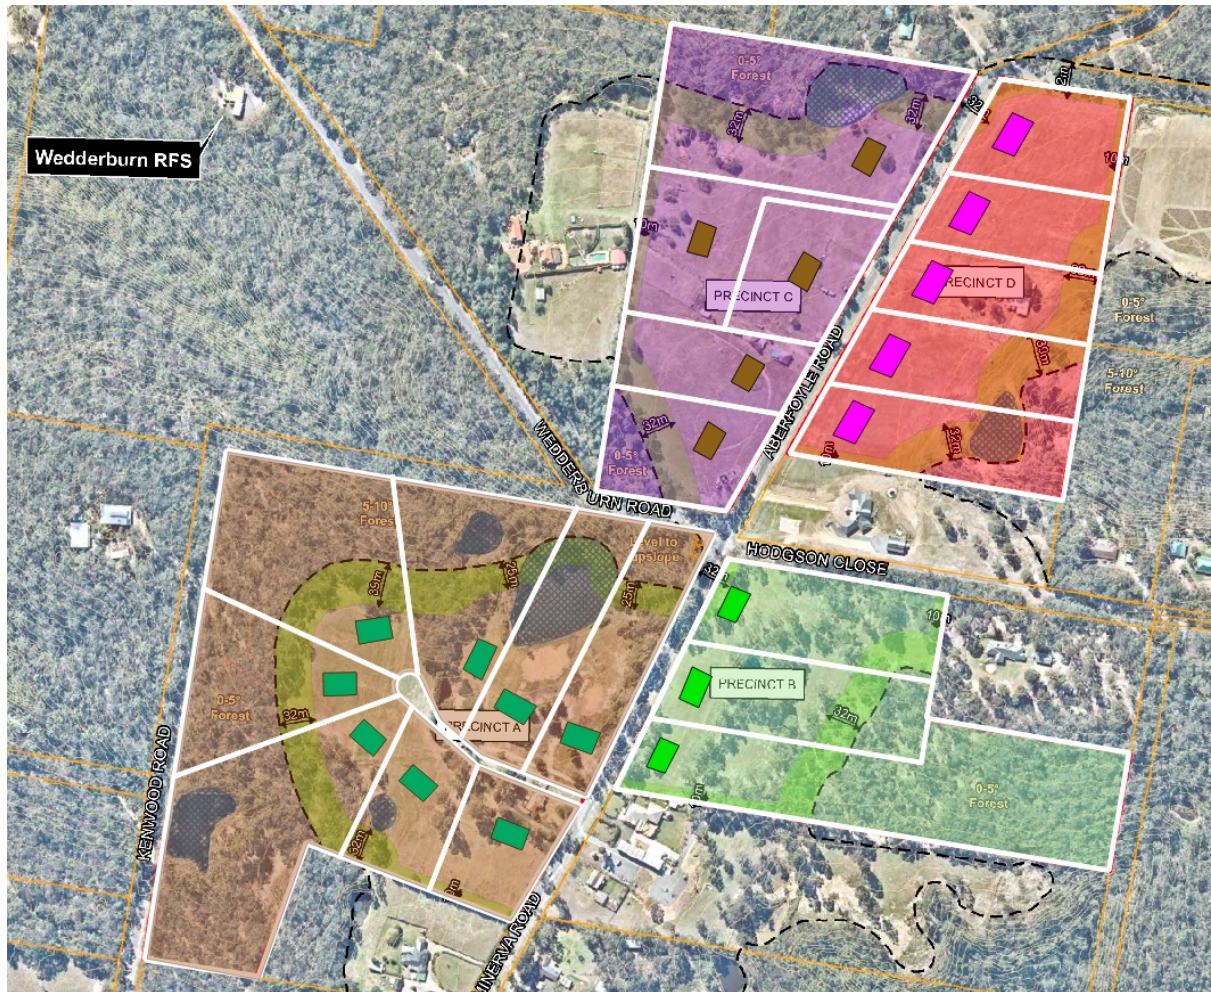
Overlay of Concept Subdivision Layout on Travers Recommended APZ Plan
